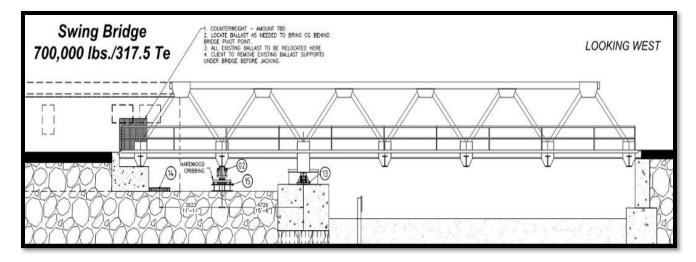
Plan view of Skidding & Jacking Material under the bridge²
